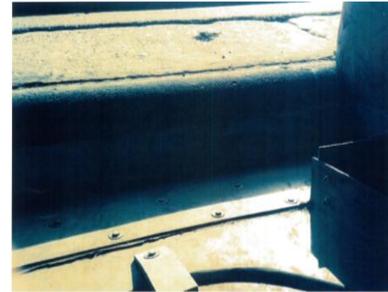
Looking southwest out of curb inlet towards Palm Avenue after BMP has been clean.
